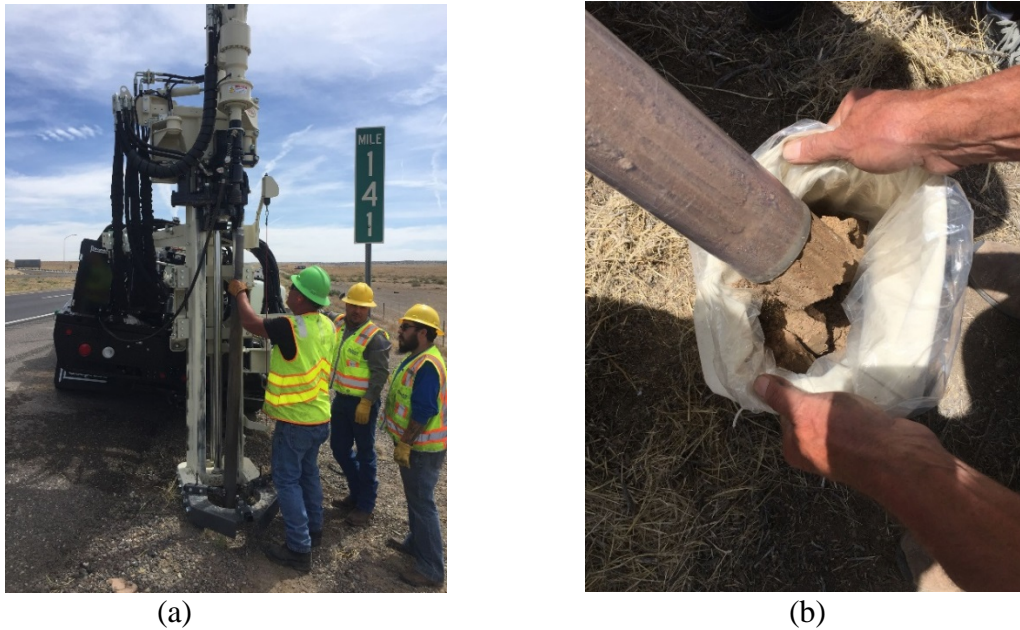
Collection of Soil Sample from I-40 Instrumentation site
